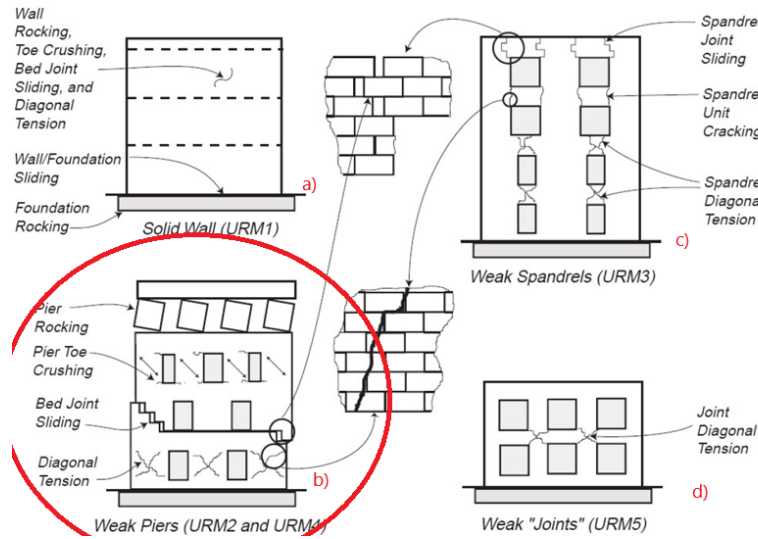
Types of masonry wall failures - FEMA [2].
